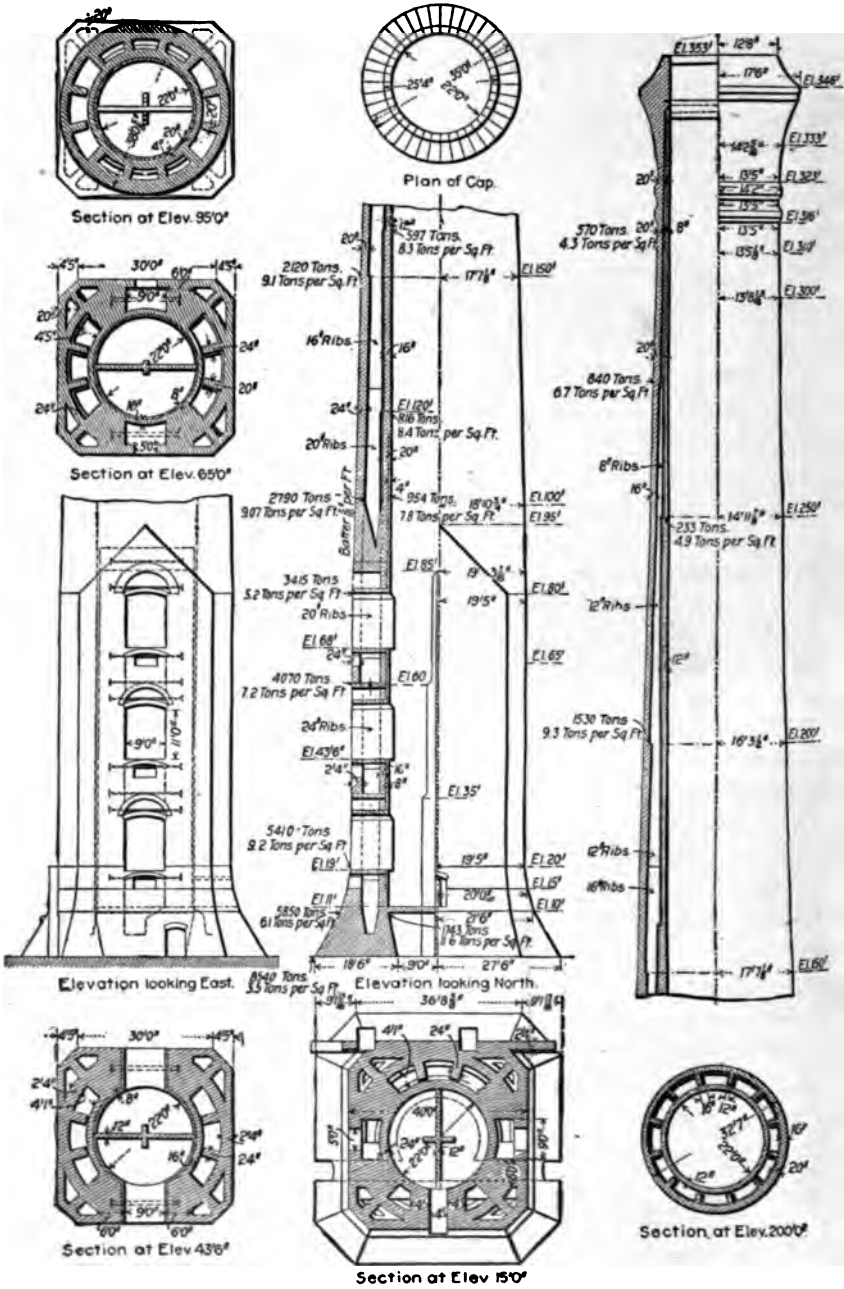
Common brick chimney, 96th St. Power House, Metropolitan St. Ry. Co New York.
